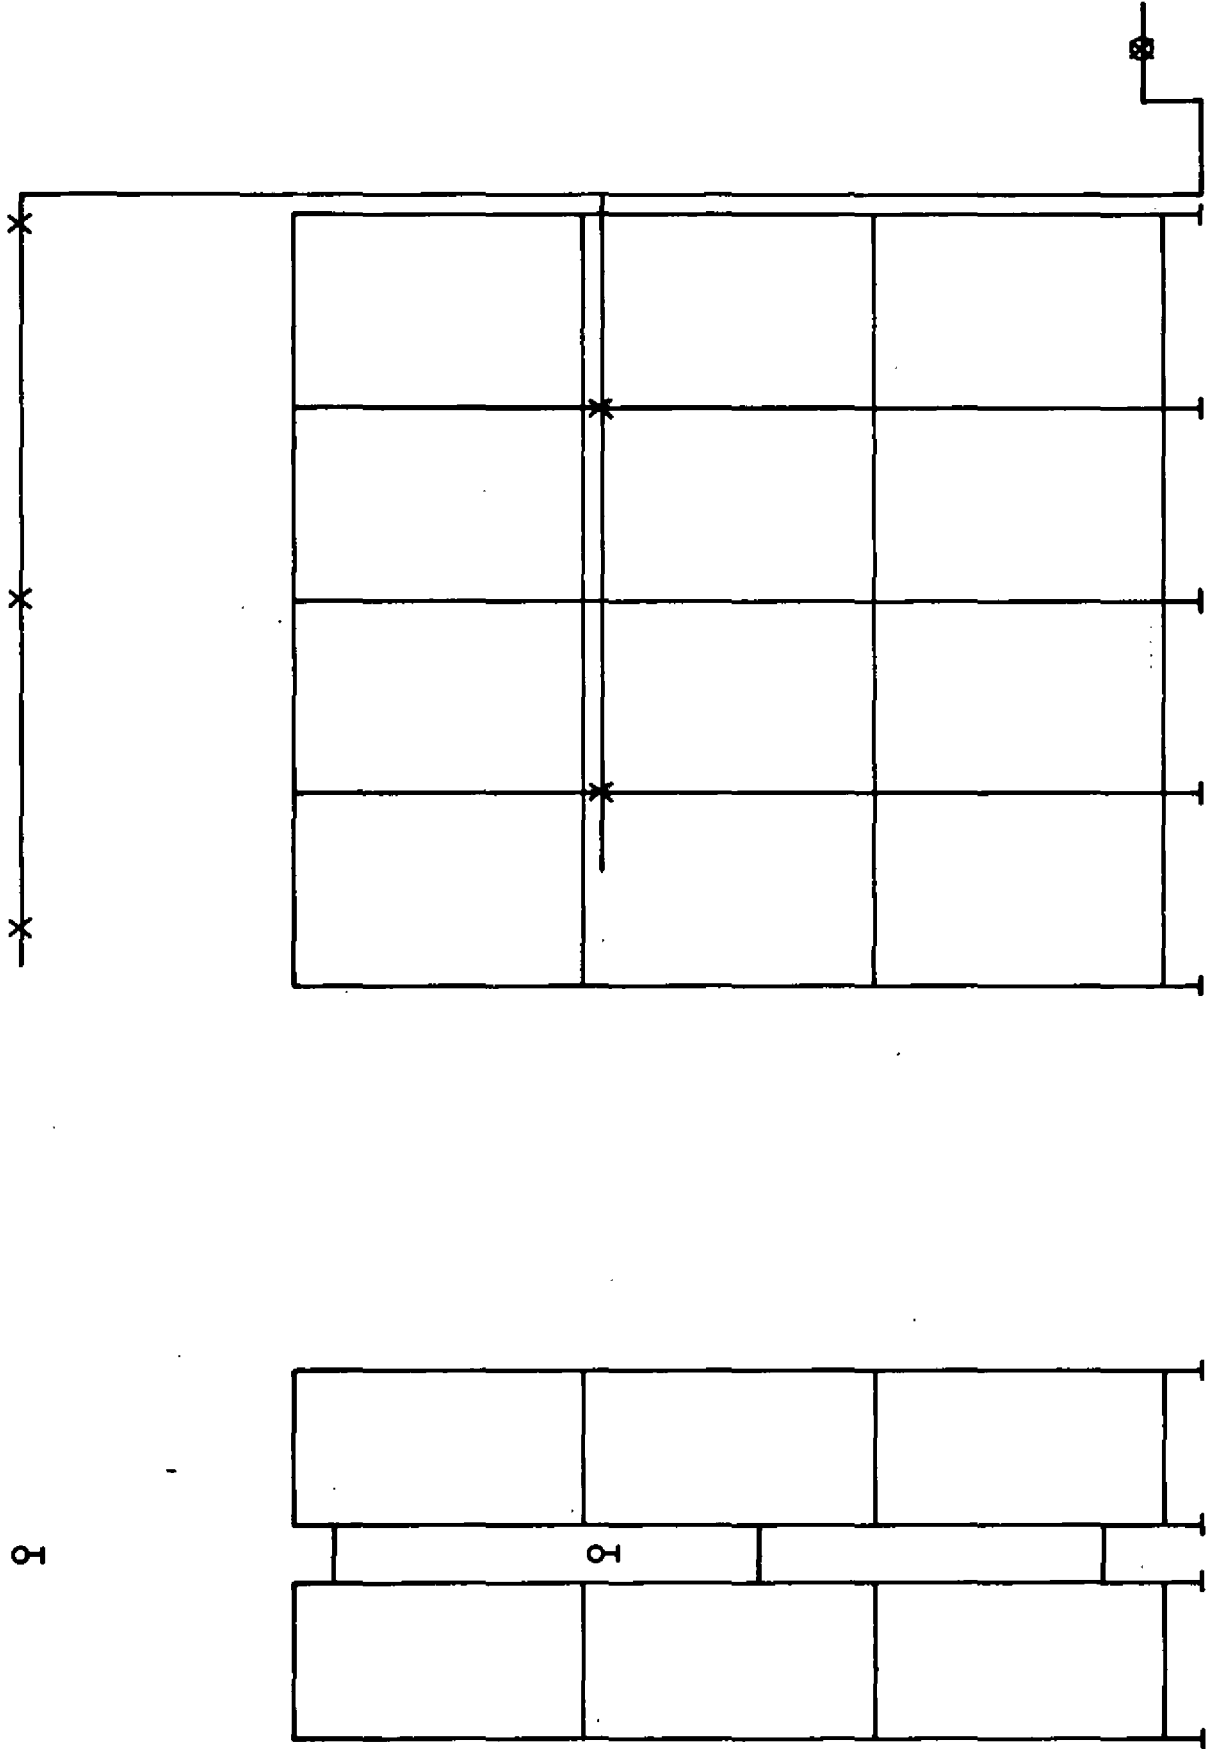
RACKING, SHOWING SPRINKLER POSITIONS — TEST 4
